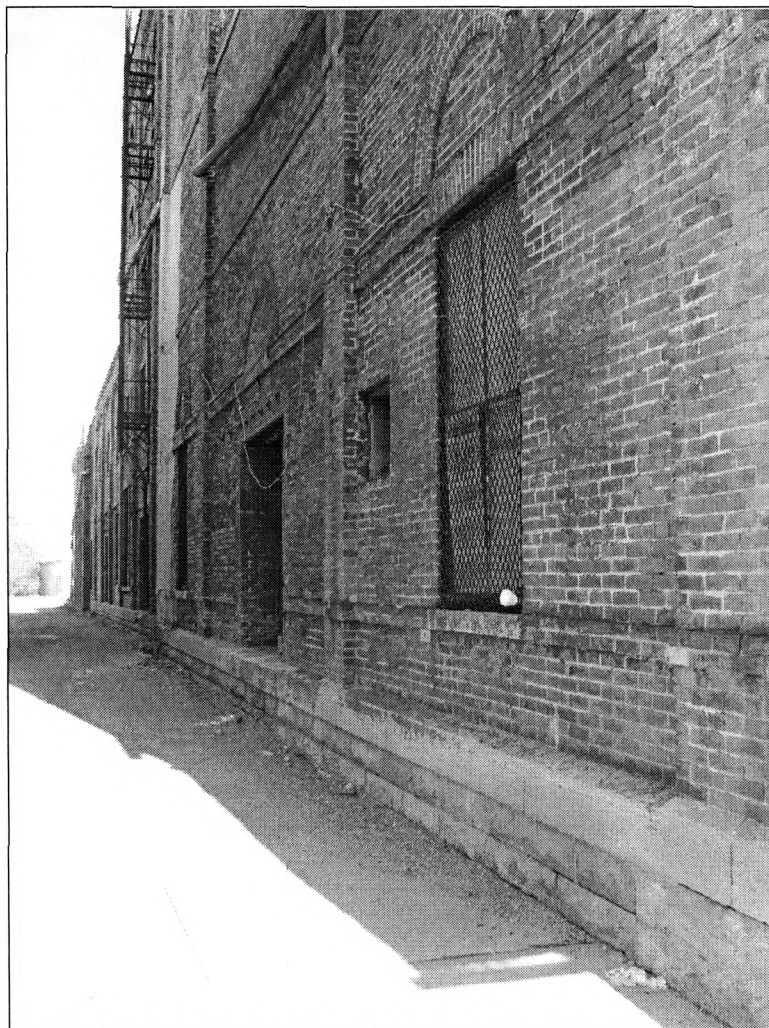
North end wall of main building, view southeast along alley (photo by J. Jacobsen, May 2007)
